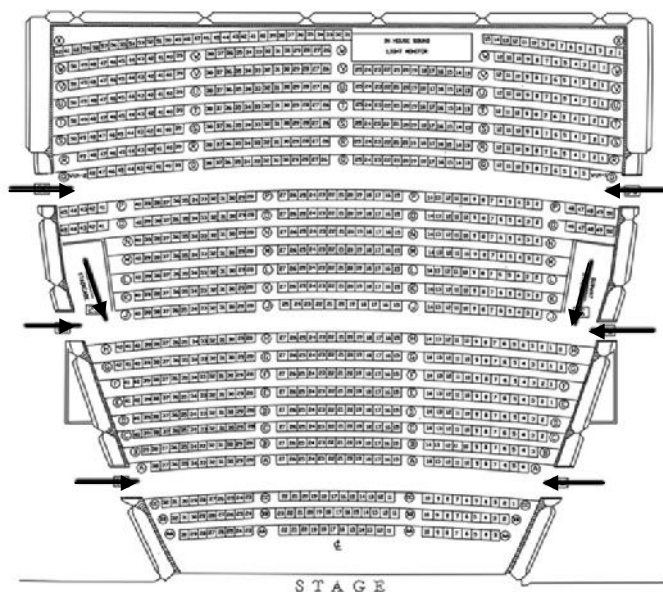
Layout plan of Jamshed Bhabha Theater
